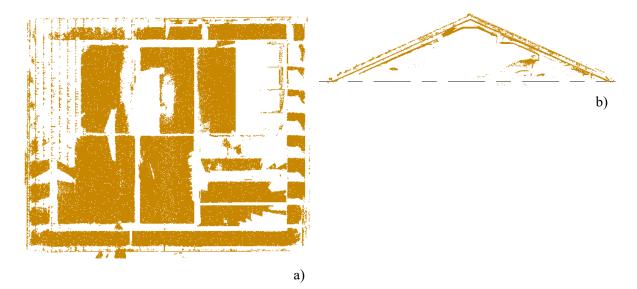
The roof was classified with different views: a)Floor plan view, b) Elevation view
